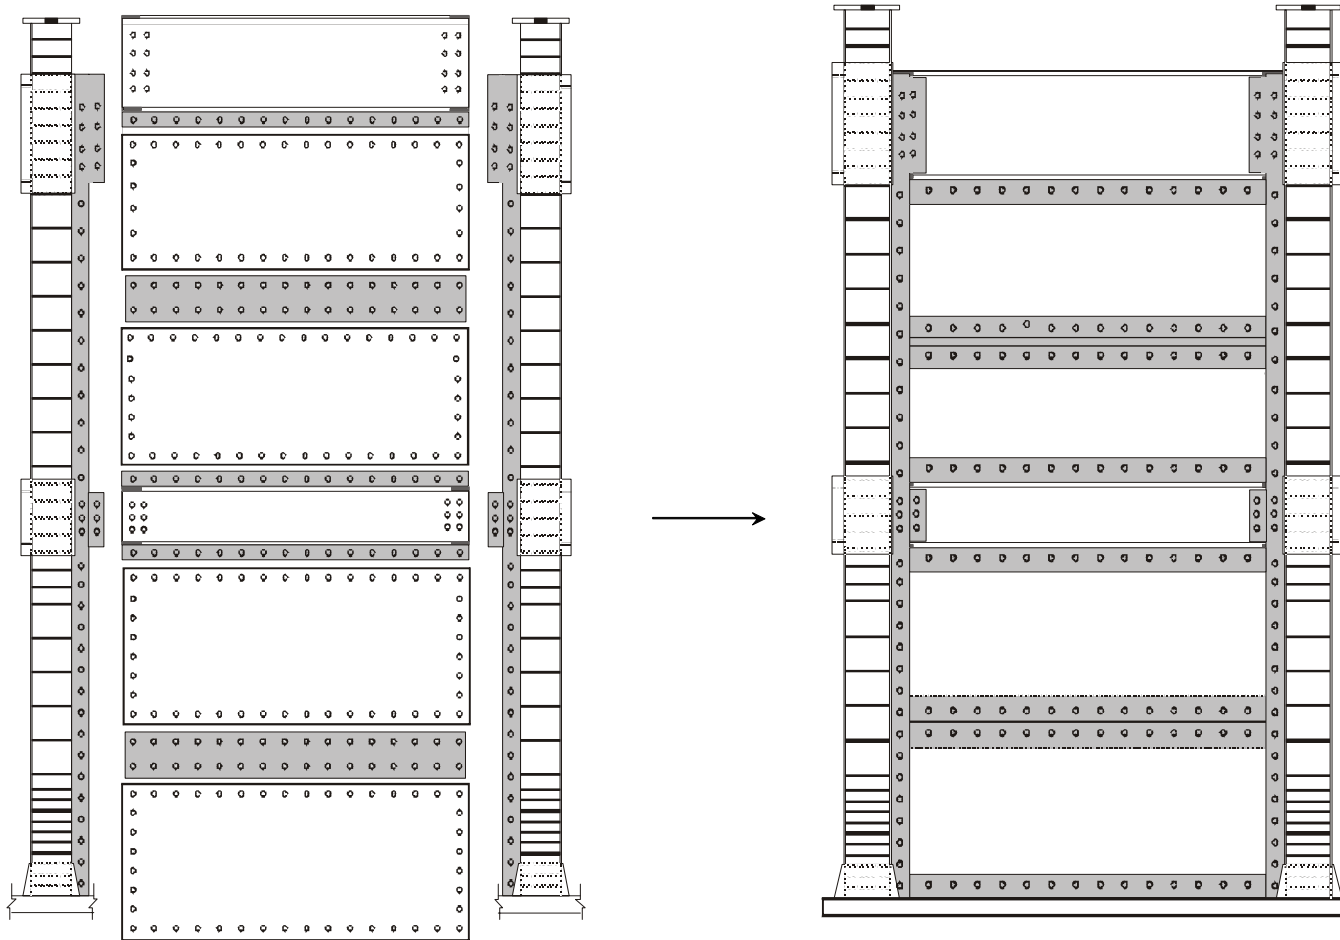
Exploded (left) and assembled (right) view of the modular test specimen
